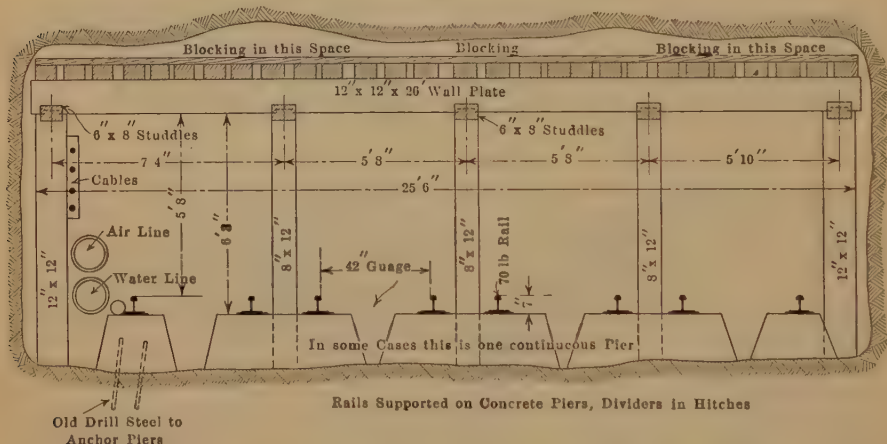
CROSS-SECTION OF PALMER SHAFT ABOVE 1050 LEVEL.
